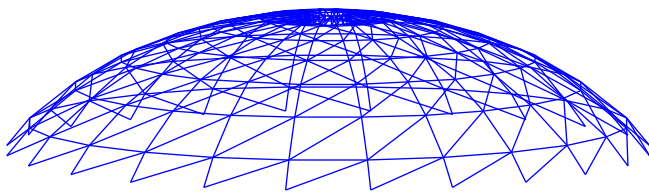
600-bar single-layer truss dome with 30 standard modules – 3D view.
